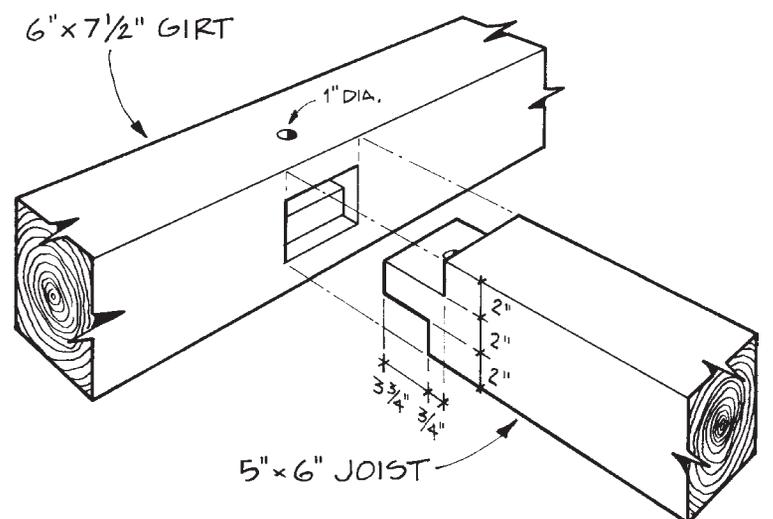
Aisle loft joist in a Dutch barn, Warnerville, N.Y.
